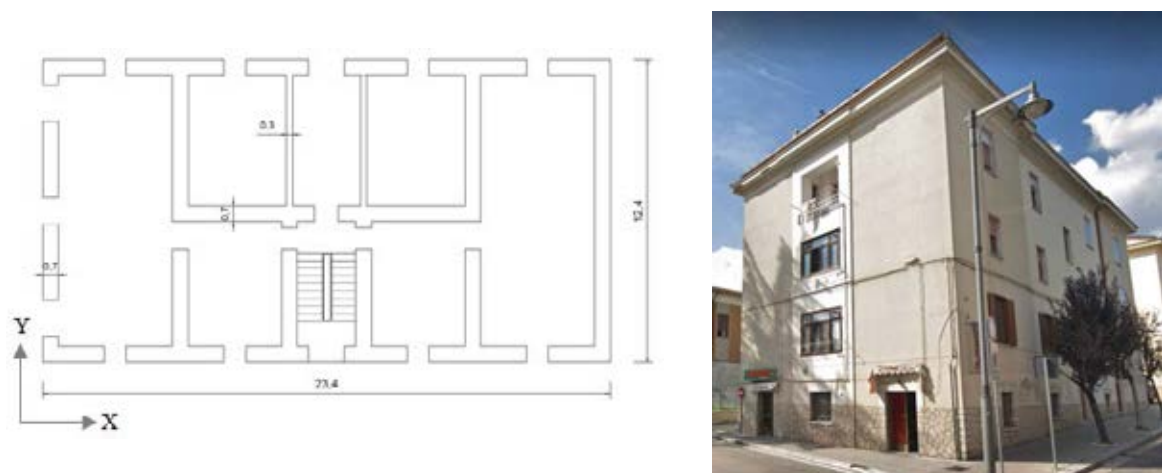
MUR3,Mr,Reg,C building typology: plan geometry of the first story (left) and a picture (right).
